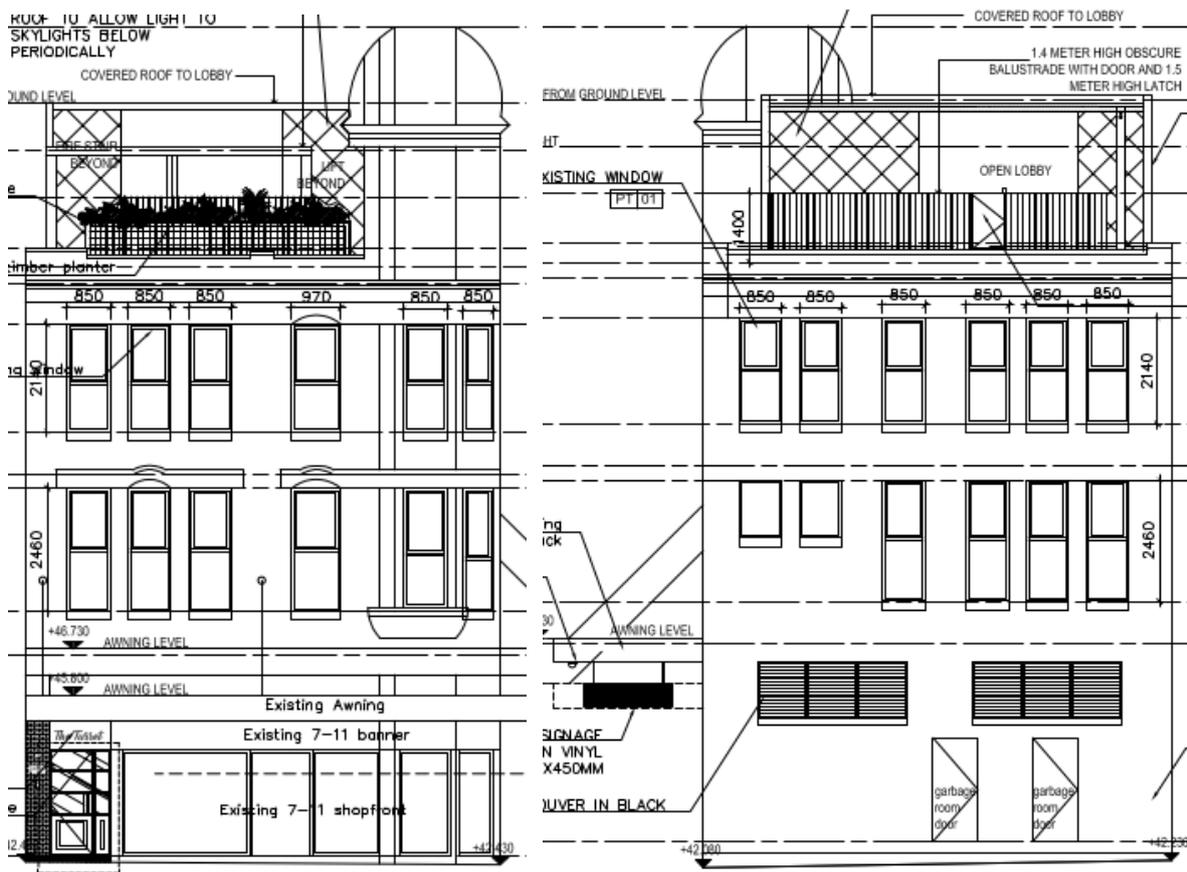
Proposed north west elevation fronting King Street (left) and south east elevation fronting Bucknell Lane (right)
